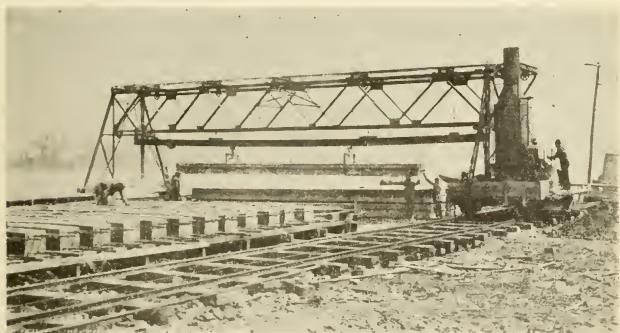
CASTING YARD FOR CONCRETE PILES.
